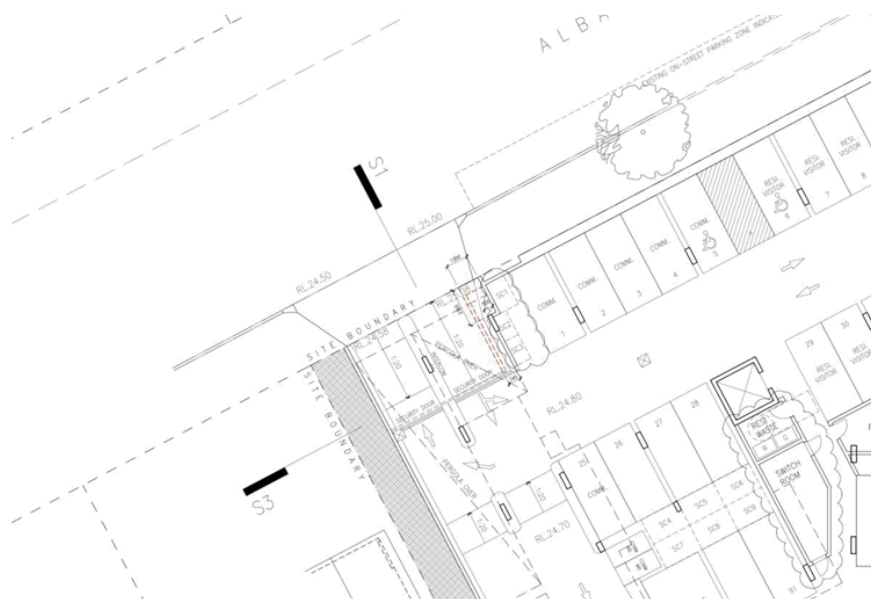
Extract of the proposed basement plan indicating the location security door and intercom to gain access to the basement car park.
